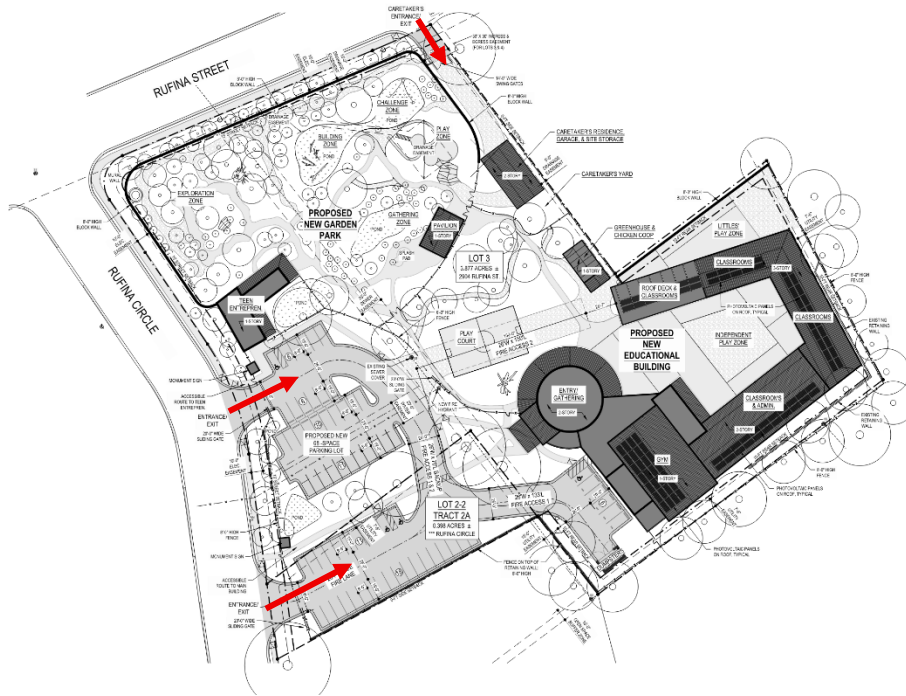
Red arrows showing site access. For more details view the TIA and Master Plan in Attachments C-5 and C-6.
